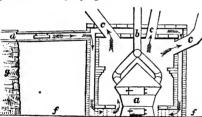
Hot-air Furnace—a, furnace; b, smoke pipe; whole being made of cast-floor; g, cellar walls.
